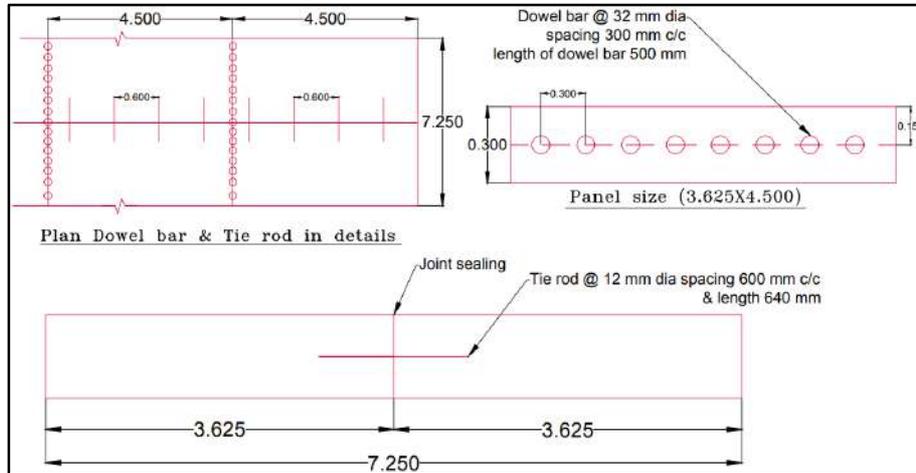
Cross Section of Slip Road showing Panel details of PQC with Dowel Bars and Tie Rods
